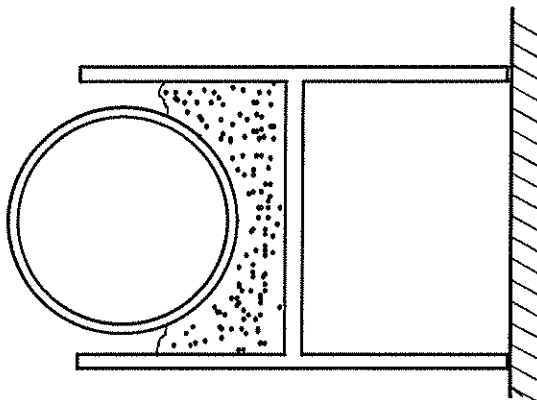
Specimen P1S-SC - Patch Used to Repair Dent in Stub Column
